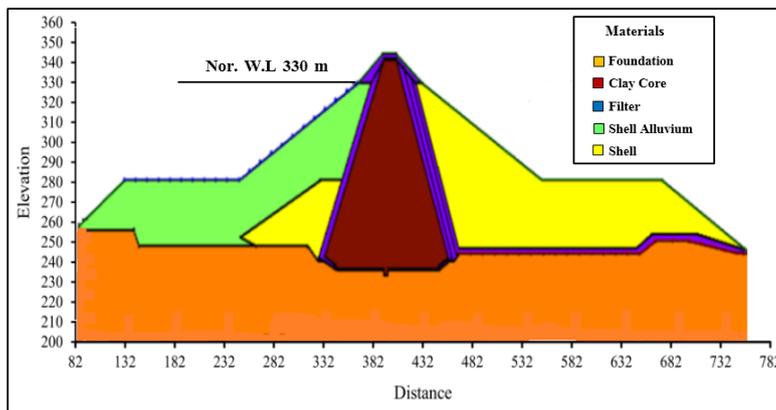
Engineering typical cross-section of Mosul Dam (Elevation in meters, Distance in meters).
